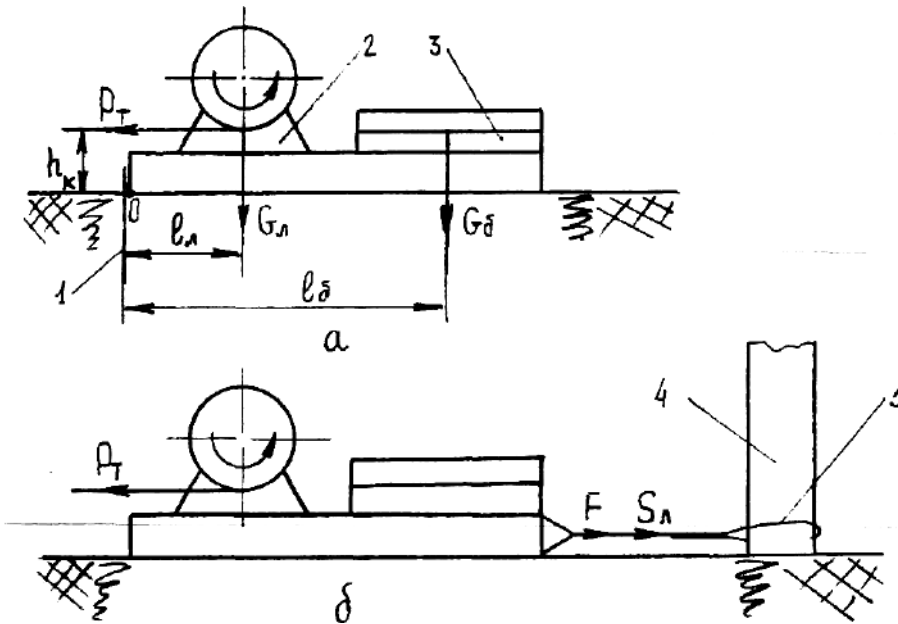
Schemes of securing the winch: 1 – emphasis; 2 – winch; 3 – ballast; 4 – column; 5 – strut.
